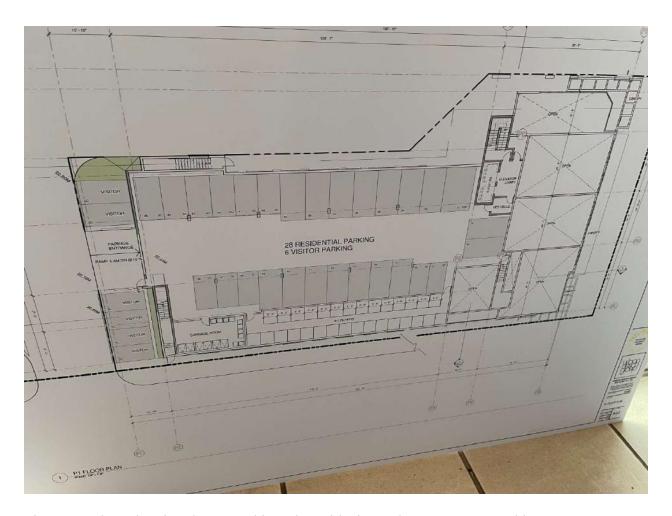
Chart showing the P1 Parking Plan with six outdoor VISITOR parking spaces.
